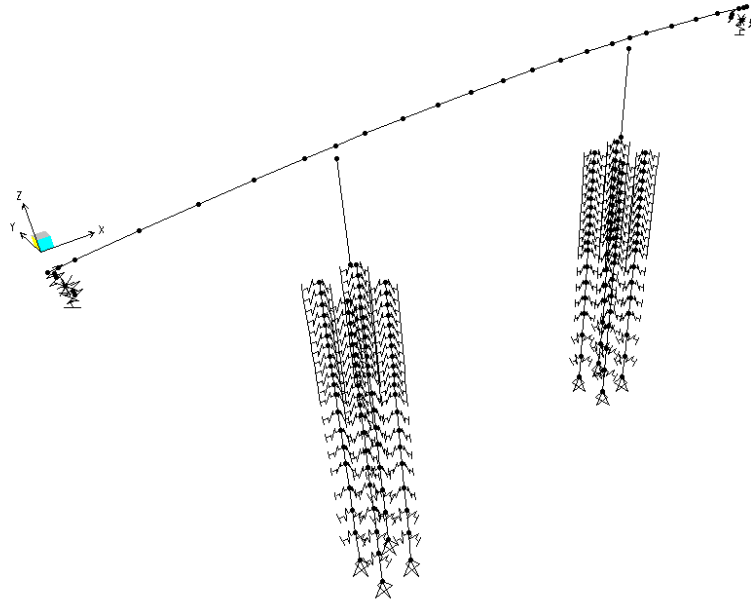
Basic layout of the 3D model that includes the pier foundation.
